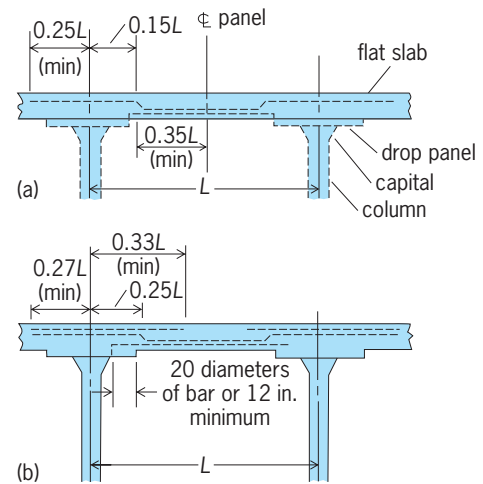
Details of a flat slab drawn in cross section at two points. (a) Middle strip. (b) Column strip.  $L$  is the center-to-center distance between columns.
